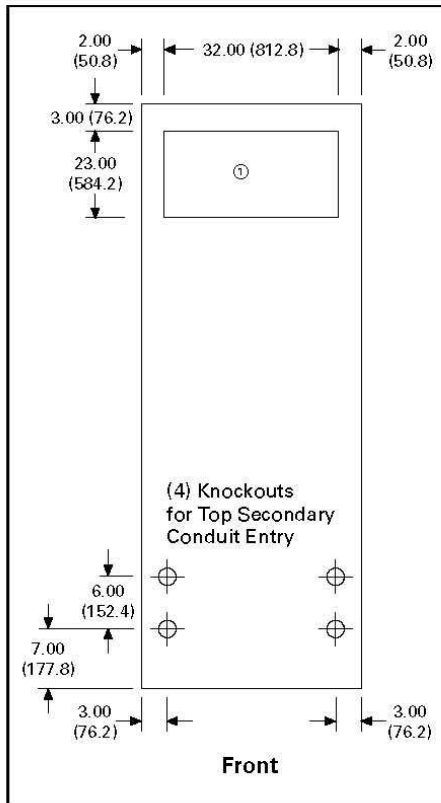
Top View of Typ. Indoor Breaker & Aux Structures
